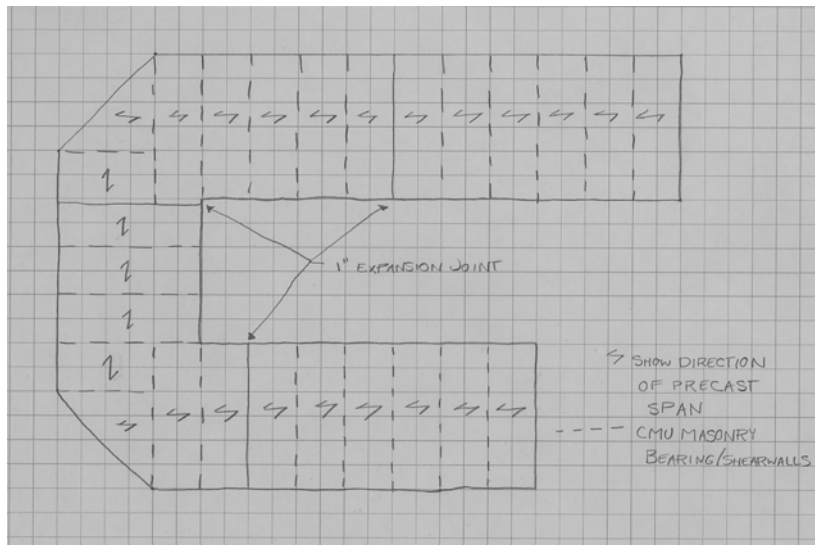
Sketch of Shear Wall Locations and Plank Spans on Typ. Floor
